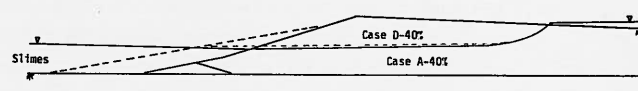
Effect of proposed cyclone tailing facing -- lower pool elevation at 10,842 feet.
